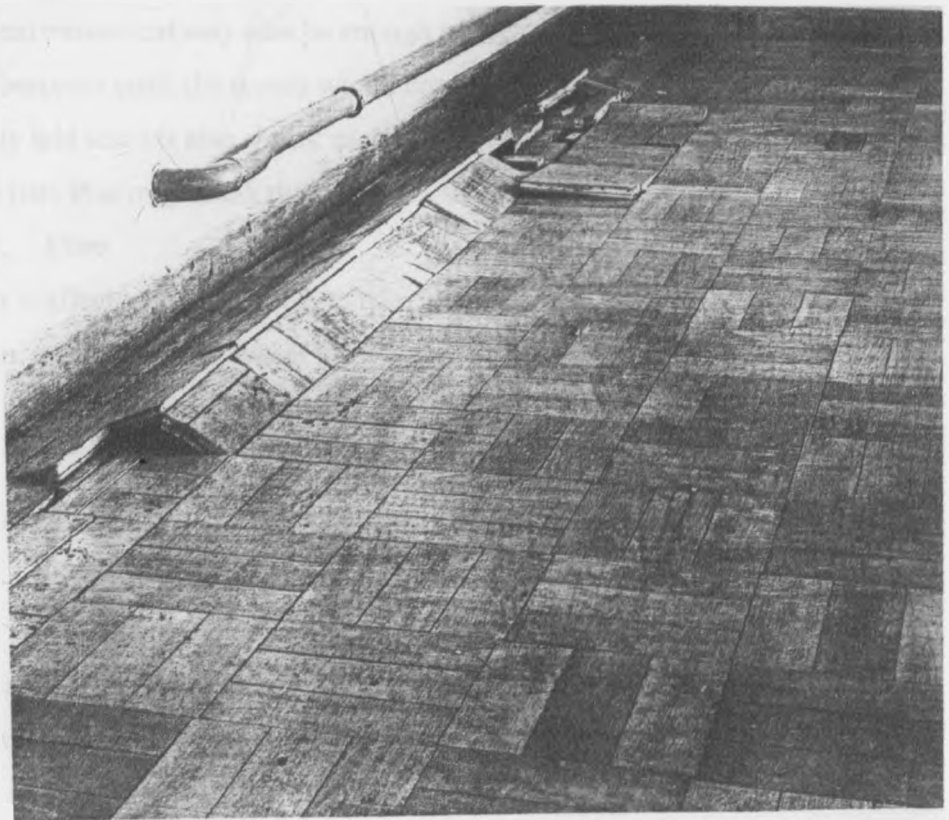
The lifting and arching of the blocks is caused by construction water, use of the building, leaks and flooding or an inadequate damp proof membrane.
